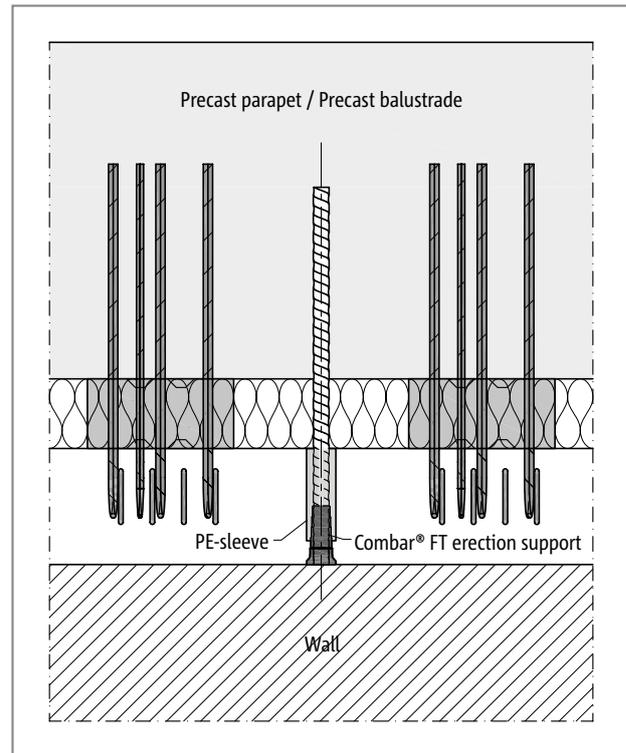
Schöck Combar® FT erection support: Installation in a precast concrete parapet; view
